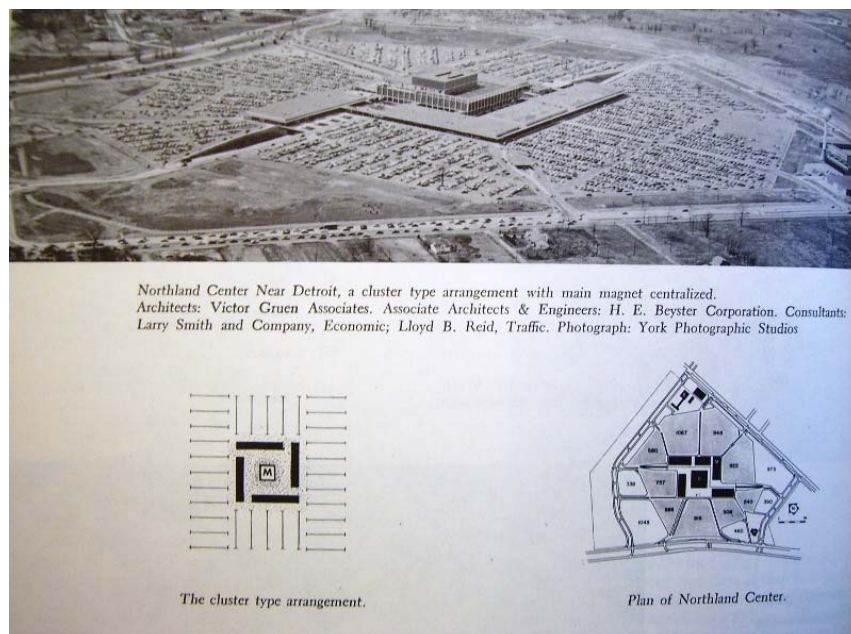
Hudson's Northland Plan, schematic, and site photo
